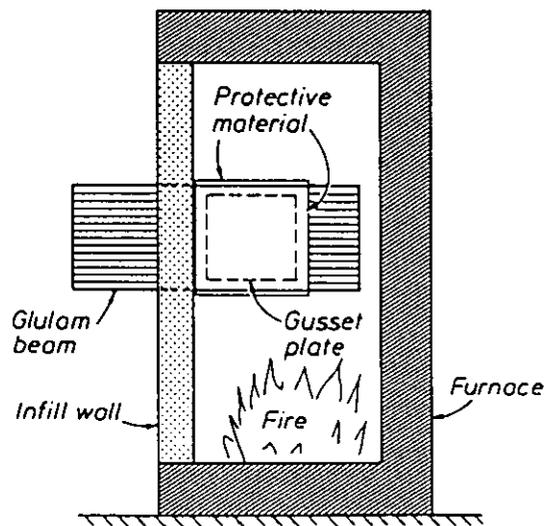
Cross-section through pilot furnace, showing revised detail for testing unloaded specimens.
